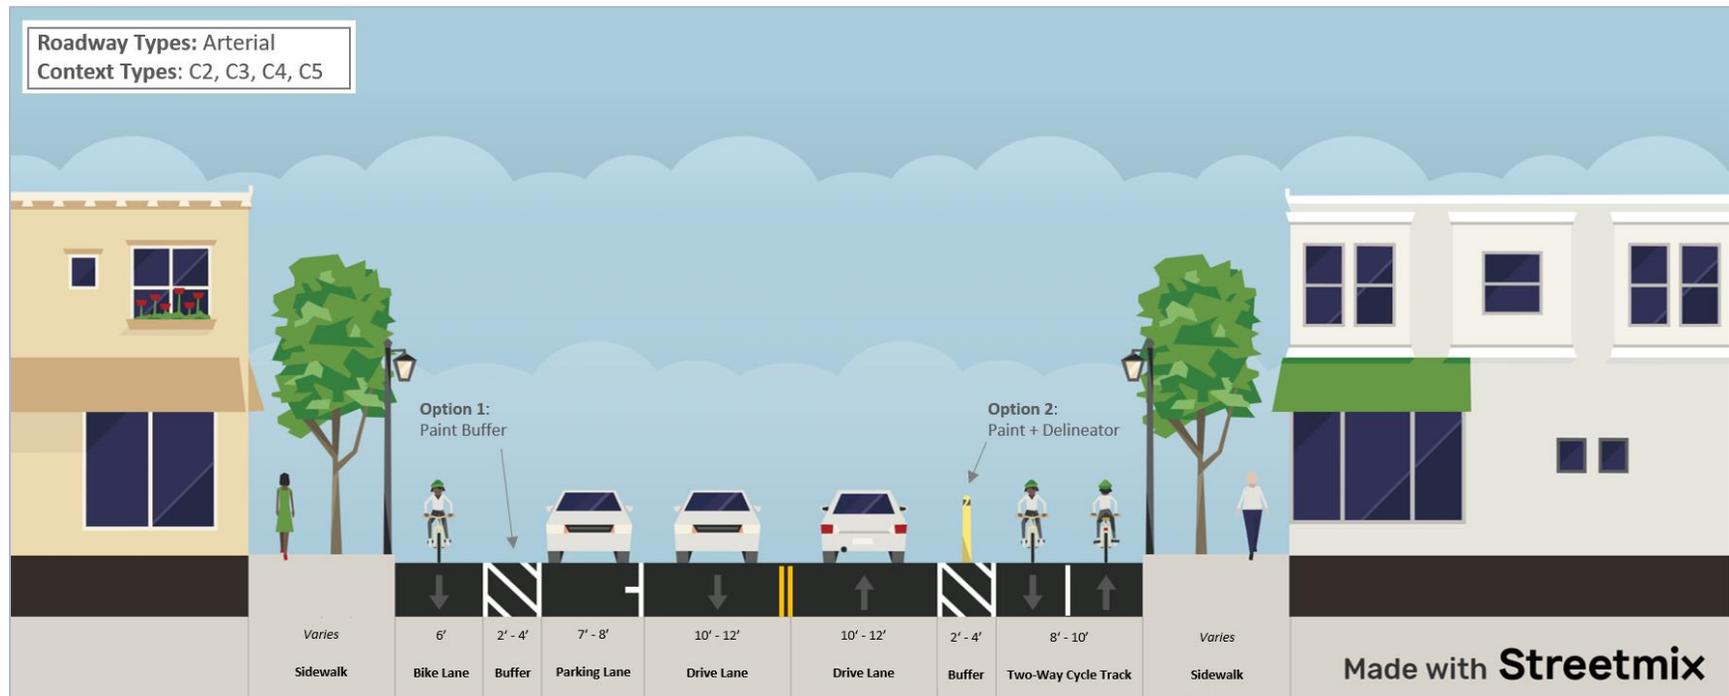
Typical Section 6 – Dedicated Bicycle Lanes
